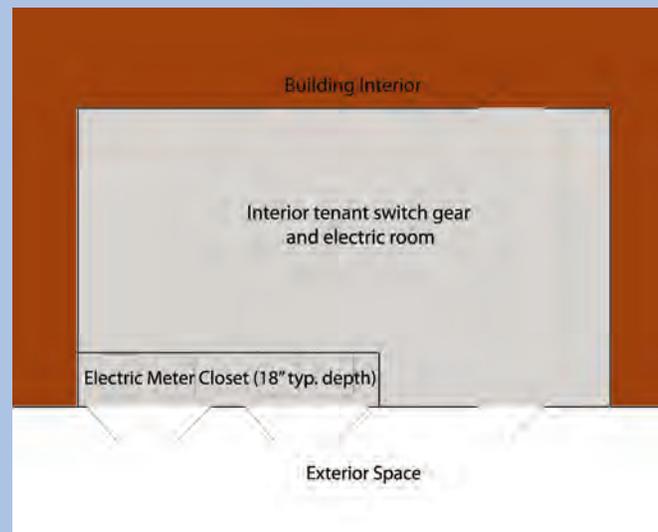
Electric meters may be placed within an exterior closet (typically not greater than 18”).
